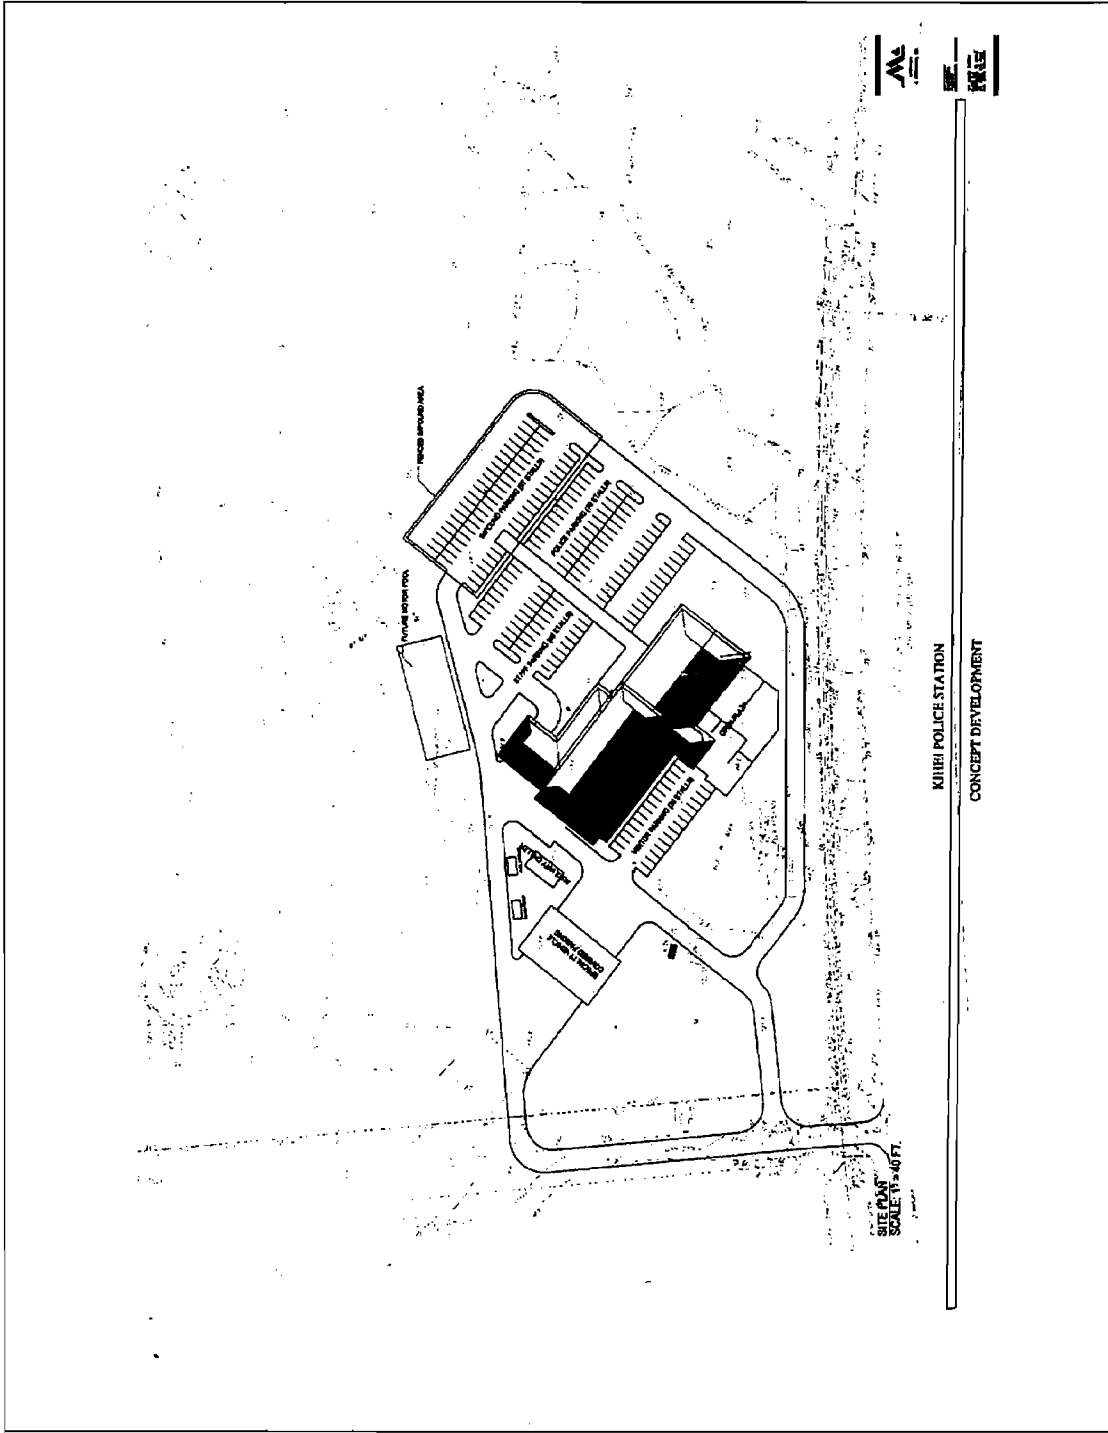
Site Plan View Map Showing the Proposed Building Plans Within the 10-acre Project Area.
